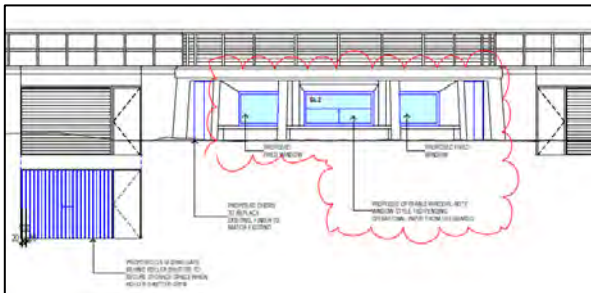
Proposed modifications to First Aid Facilities and Tunnel 3.
